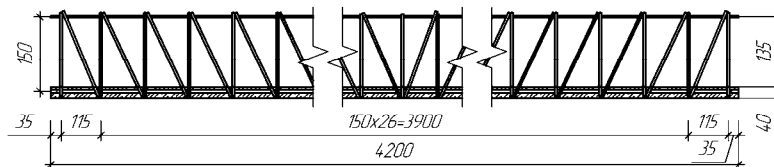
The construction of reinforced concrete deck form floor slabs of grades P-3 and P-4
